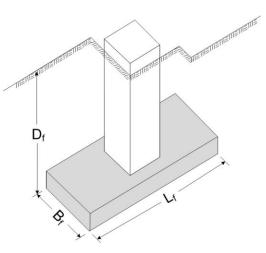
Schematic. Geometry of a typical spread footing foundation (AASHTO 2002).
